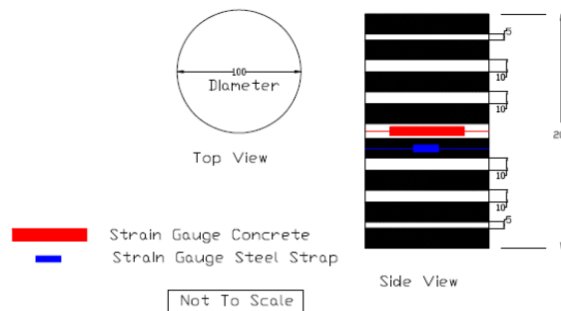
Detailed of specimen size and strain gauge position. (Unit in mm)
